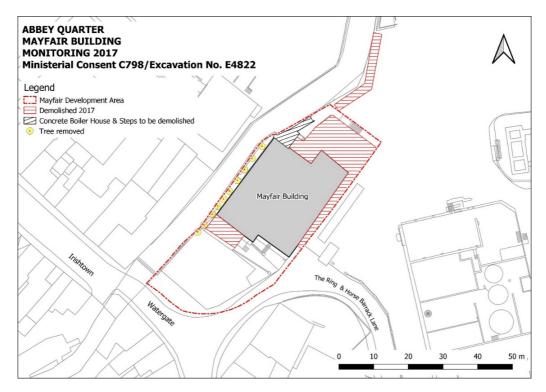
2017 Ministerial Consent for Excavation work to Mayfair site
